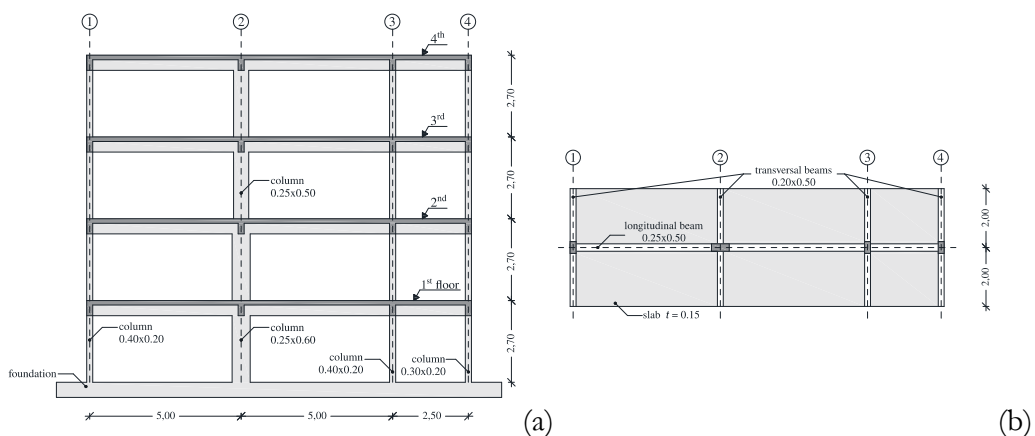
Case study concrete frame: (a), elevation view and geometrical dimensions (b) in-plane view of the slabs
